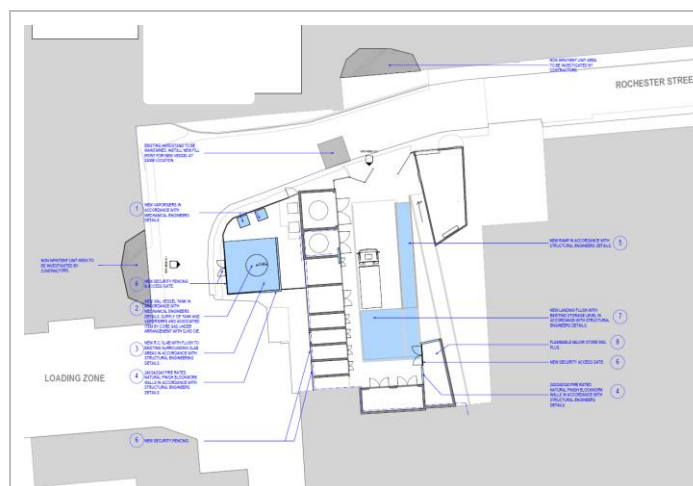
Approved Level 1 Plan – Western Campus (source: Jacobs, dated 19 February 2024)
